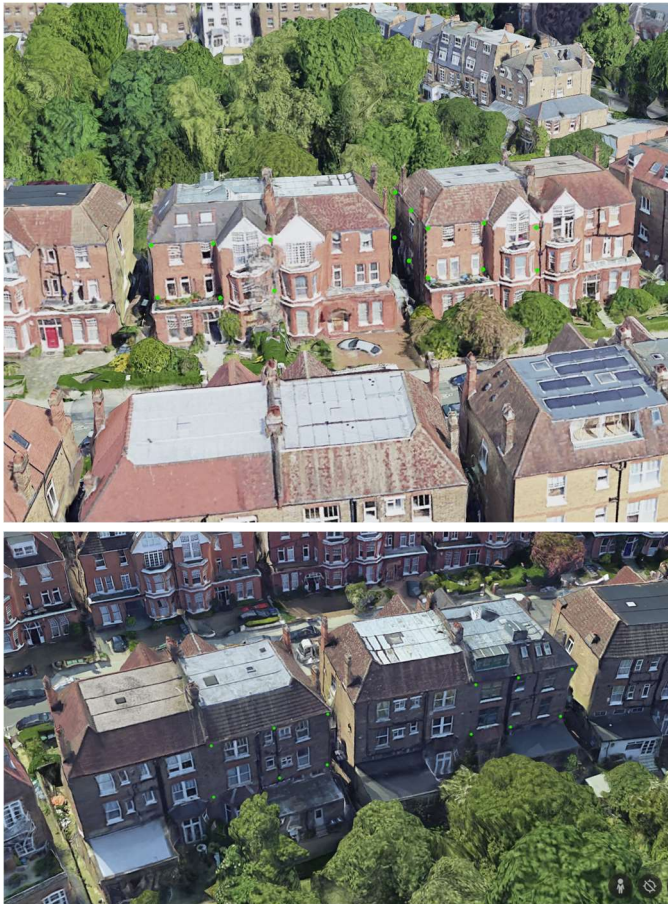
Proposed monitoring locations on adjacent building façades (image courtesy of google earth).
